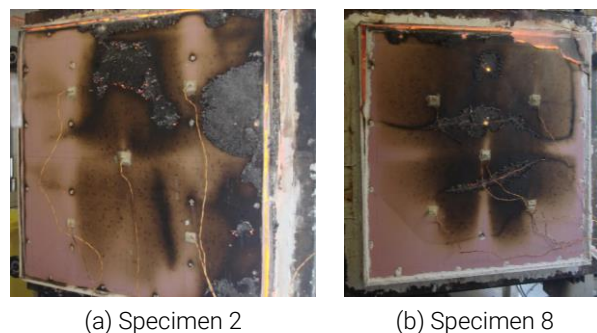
| Unexposed surface of Specimen 2 and Specimen 8 after fire exposure.
